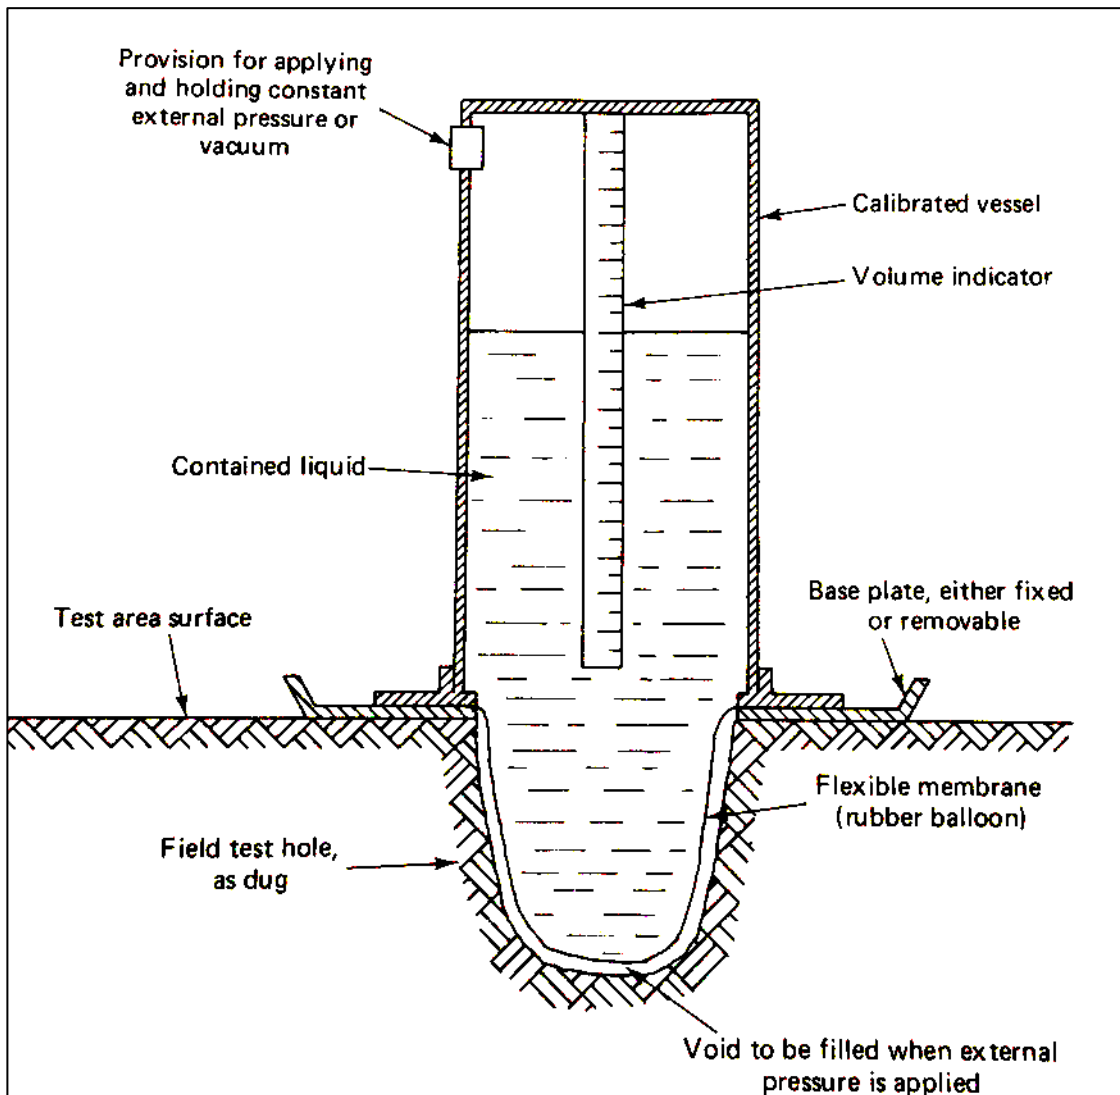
Schematic drawing of calibrated vessel indicating principle (Liu and Evett, 2000)
